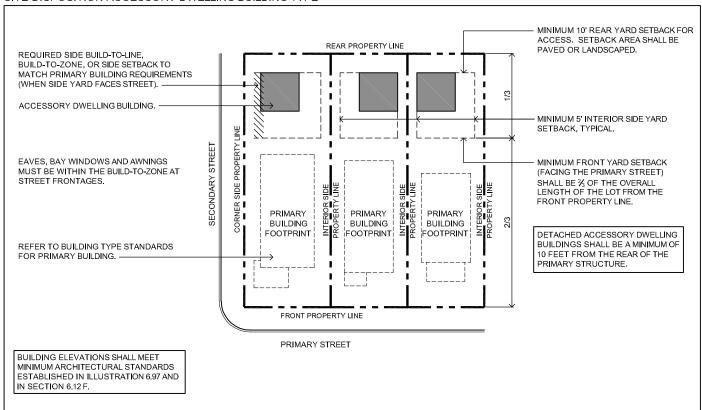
ACCESSORY DWELLING UNIT TYPE
